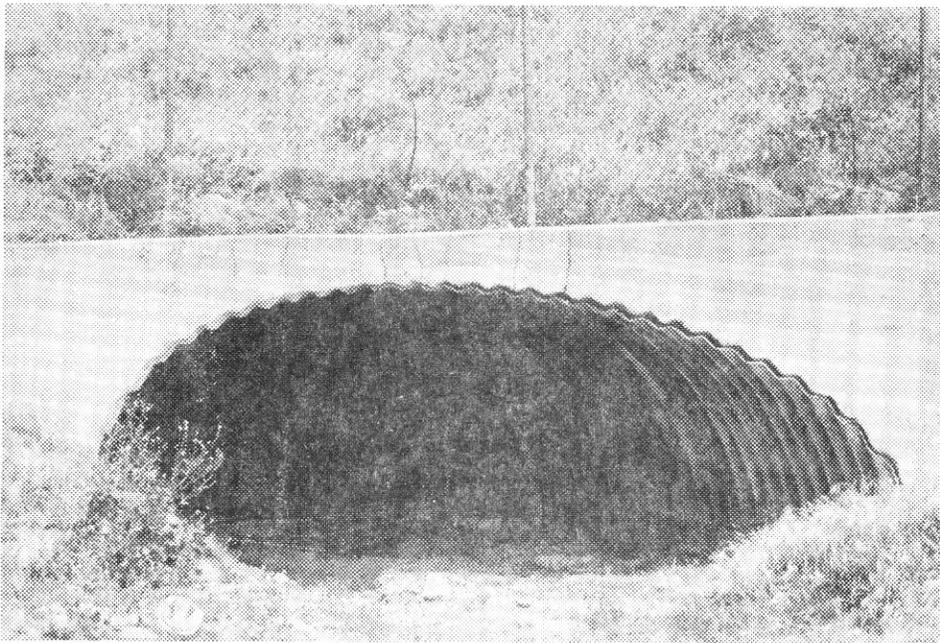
Cracking in drainage structure endwall. Note separation of concrete and metal at top of structure.
